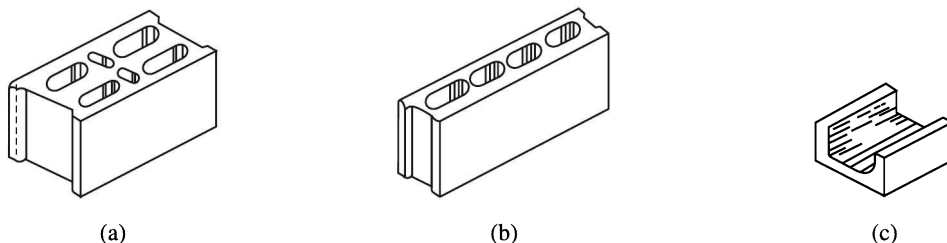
Concrete blocks (a) and (b) Hollow concrete blocks nominal length 390 mm and height 190 mm. Thickness for load bearing walls 190 mm, compound walls 140 mm, filler walls 90 mm. (c) Lintel block for R.C. Lintels.
